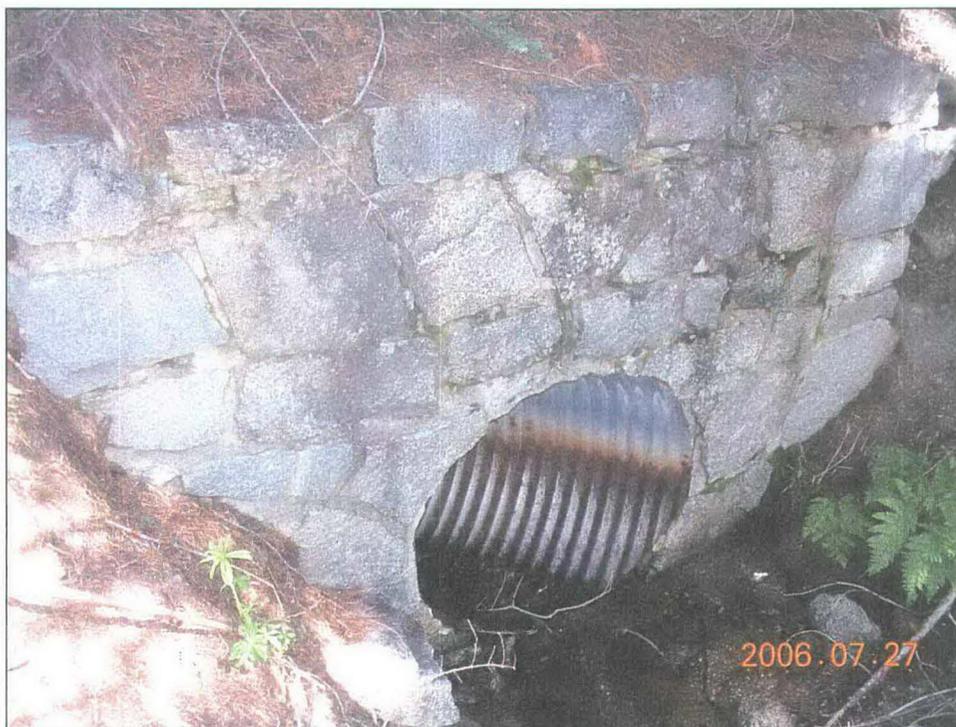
Example of 36-inch Pipe Culvert Headwall (at East Fork Sentinel Creek, Mile 13.57)
